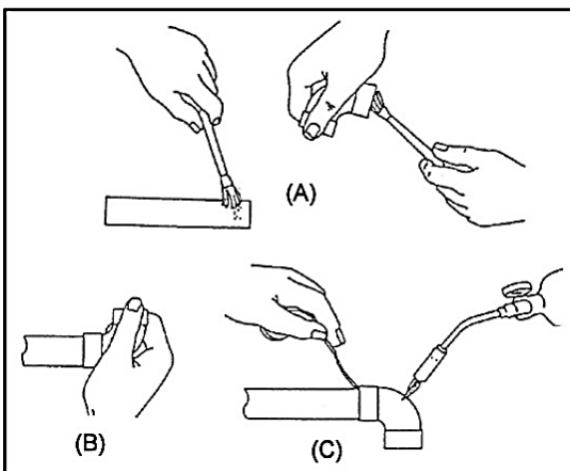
Copper Tubing Solder and Compression Fittings.
